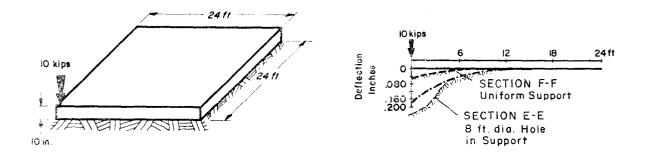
Pavement slab subjected to 10-kip wheel load at the corner; with and without uniform subgrade support.
